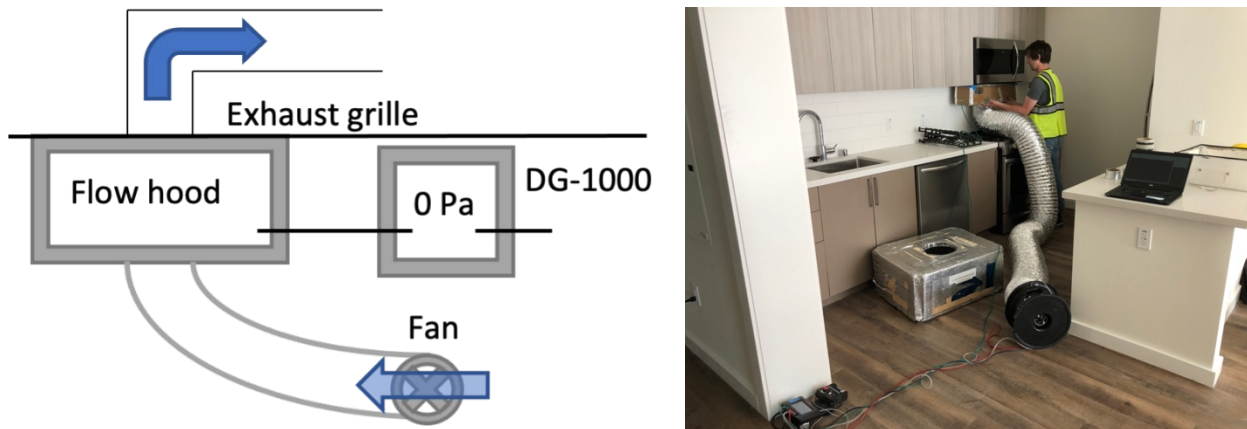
Ventilation grille testing: diagram of the test (left); photo during field testing (right).
